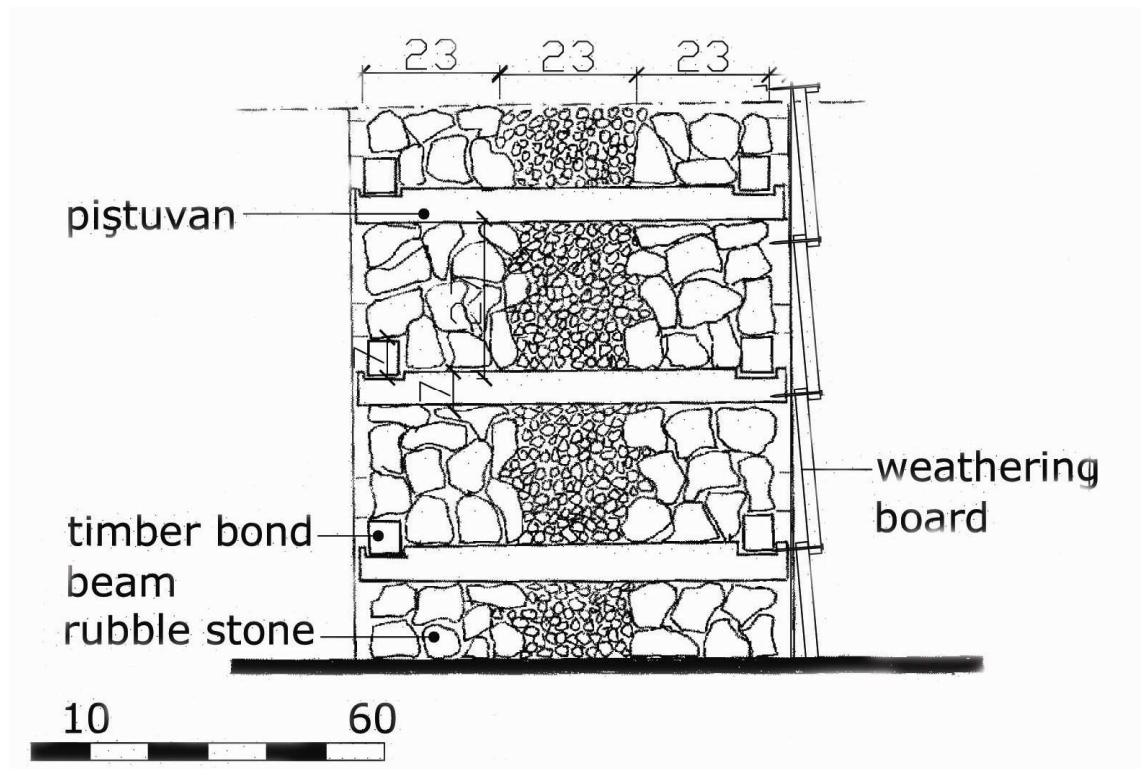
13 Drawing of the wall type 5. Çelik 2008.
